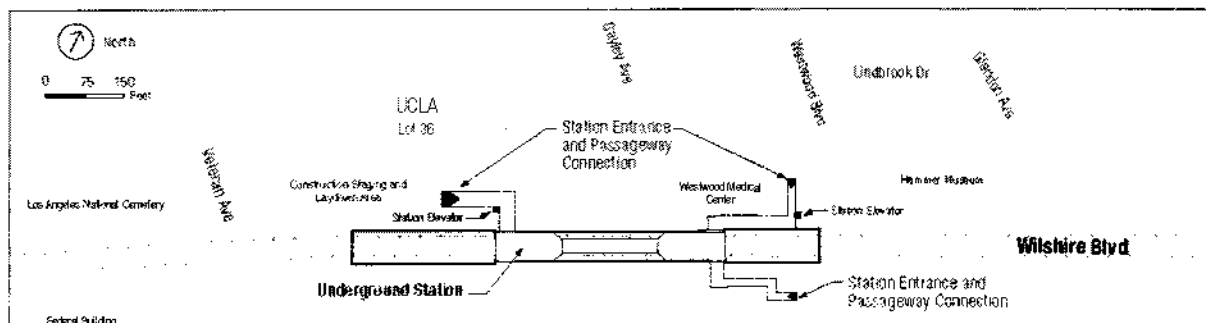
Westwood/UCLA On-Street Station (recommended)
